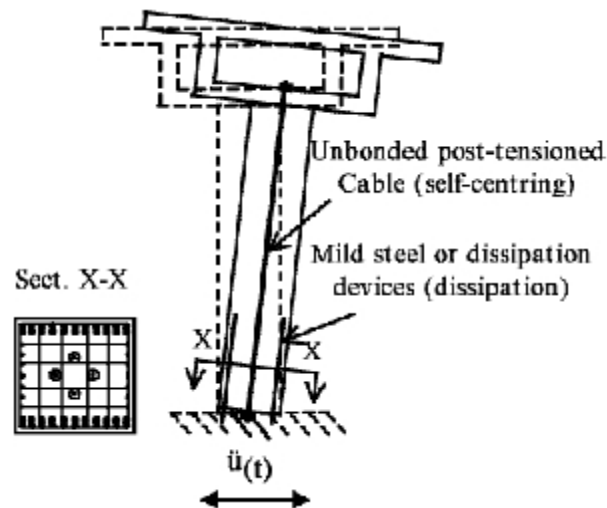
Hybrid Concrete Bridge Column (Palermo et. al., 2005)
